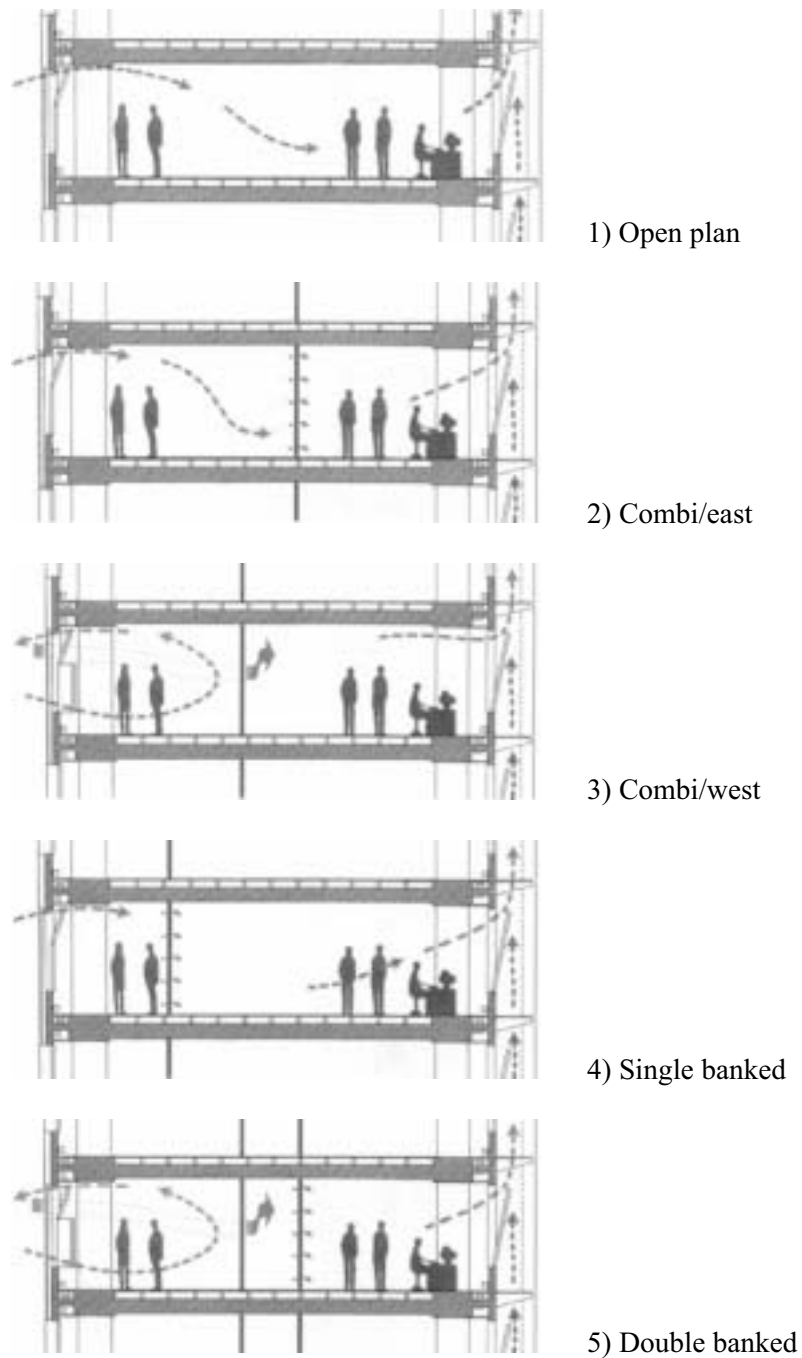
Section drawings corresponding to the plan drawings in figure 4.14 showing the ventilation air-paths in section for the five possible plan layouts. (1) Open plan 2) Combi/east 3) Combi/west 4) Single banked and 5) Double banked.).
